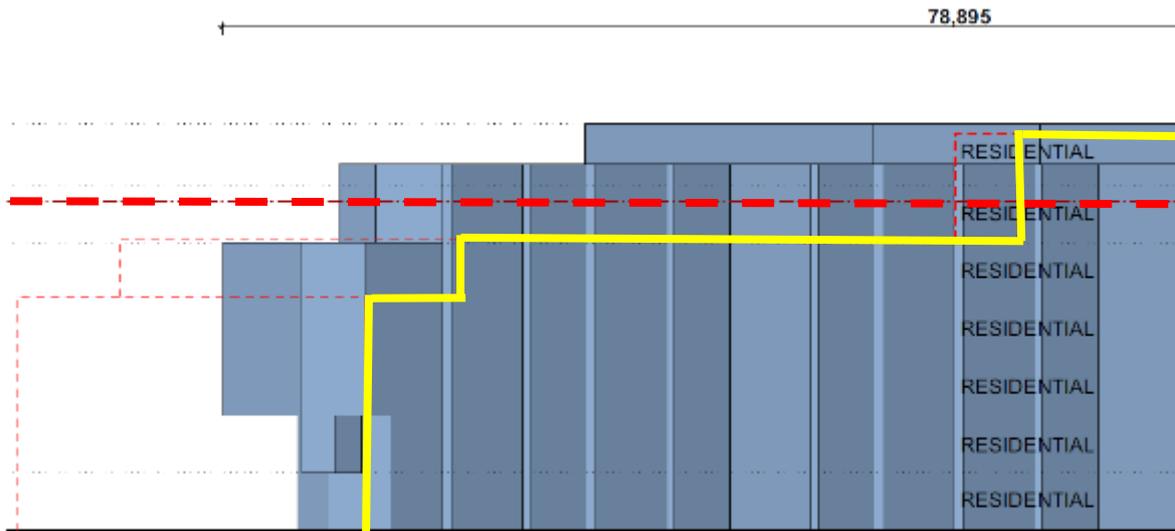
South elevation of building E (Parkside building). The yellow line shows the approved concept envelope and the red dashed line shows the 18 metre height limit.
